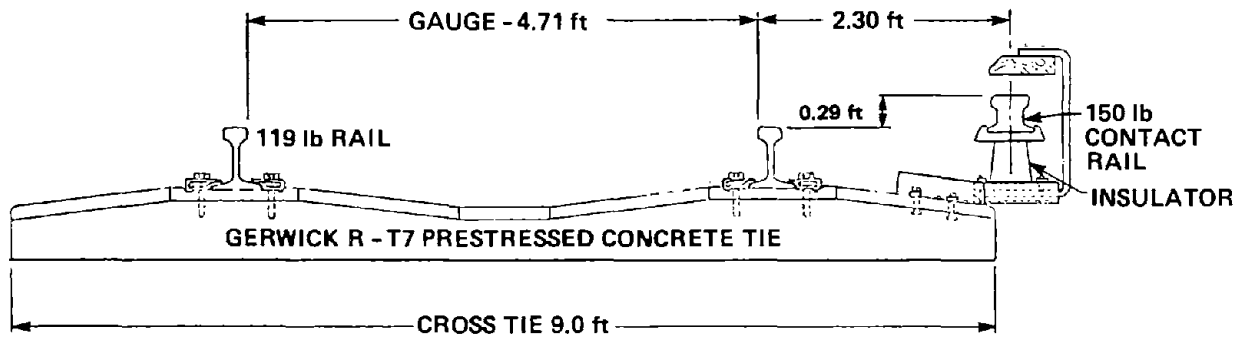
TEST SITE NO. 1 - WELDED RAIL ON CONCRETE TIES.
